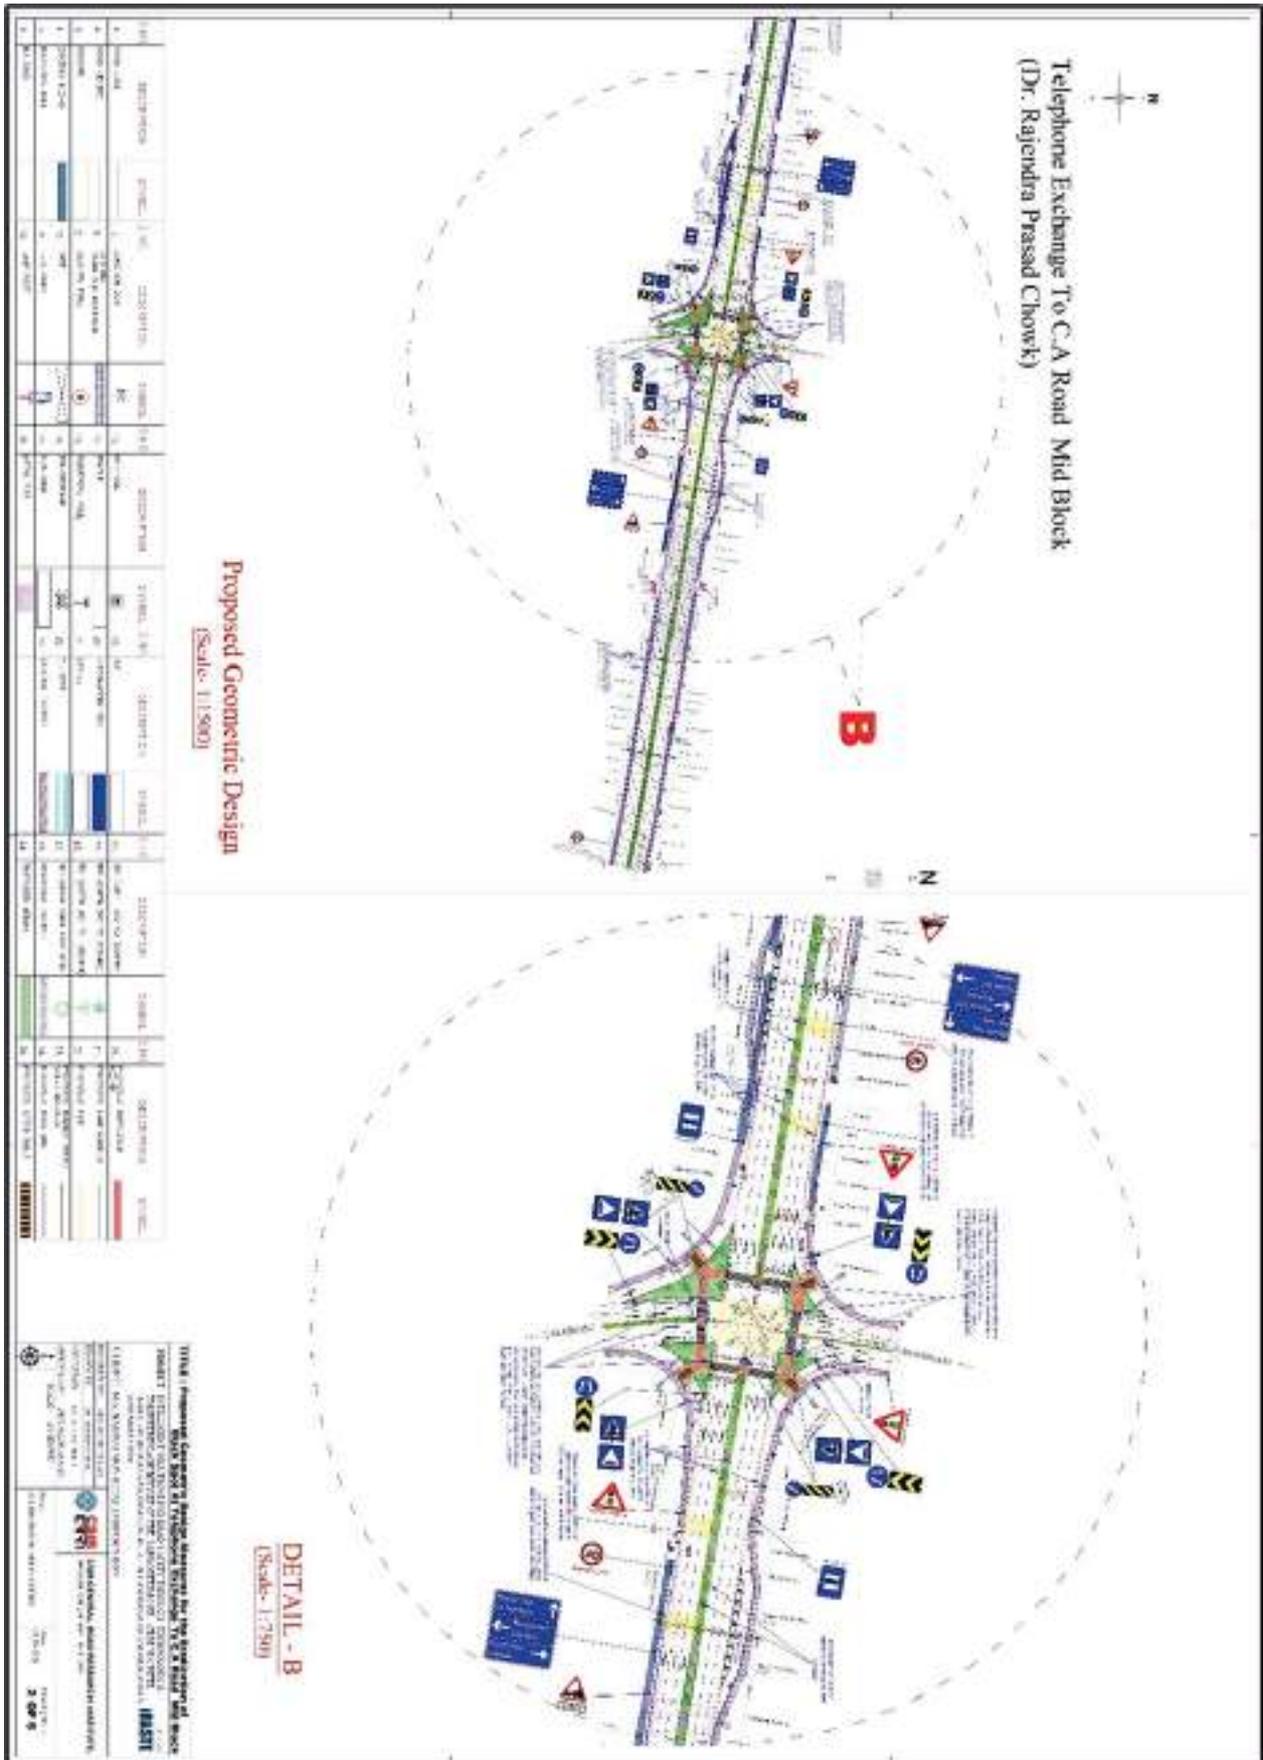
Detailed Geometric Design Plan (GDP) & Traffic Management Plan for Telephone exchange to C.A. Road stretch.
